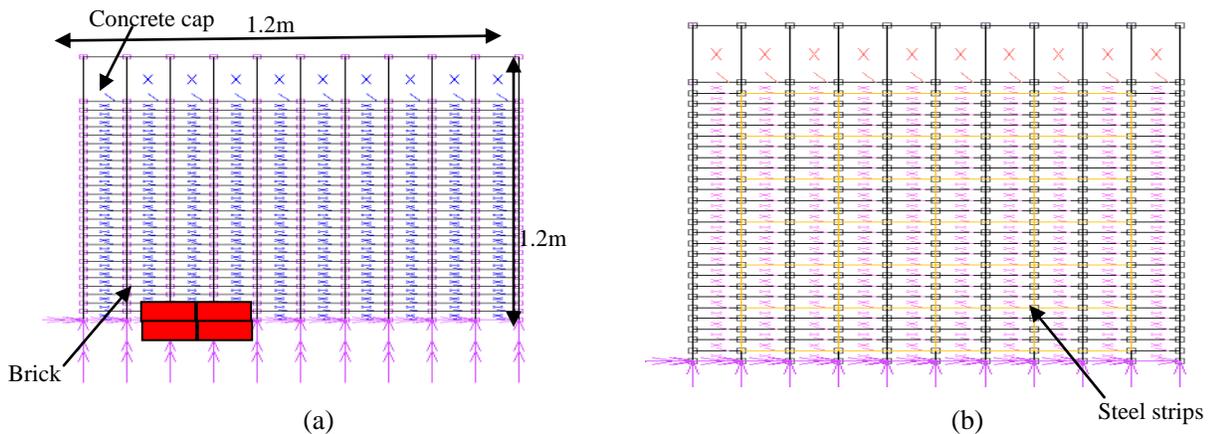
Geometric model of wall panels (a) un-reinforced masonry (b) strengthened masonry with fine steel mesh
